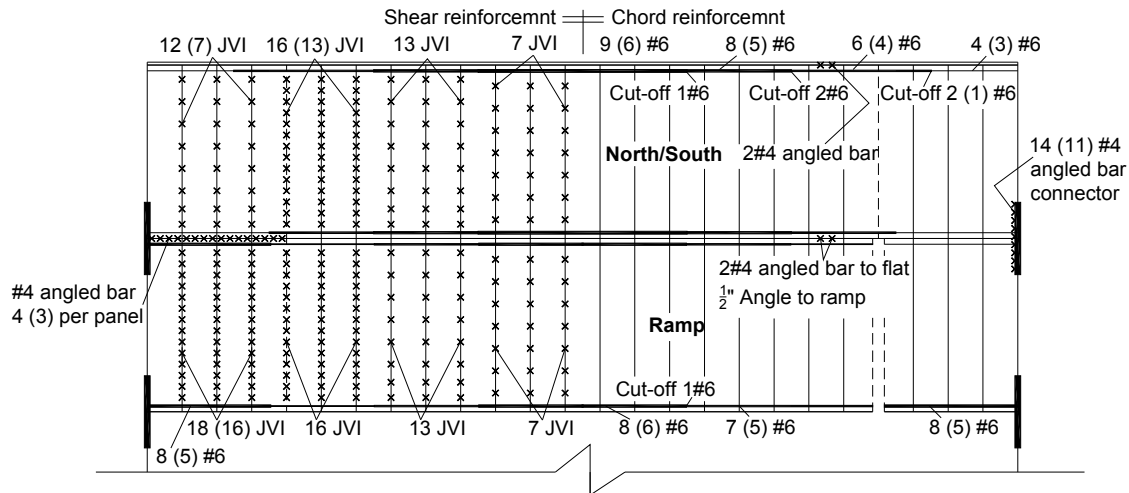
Diaphragm reinforcement design for design example 1A.
